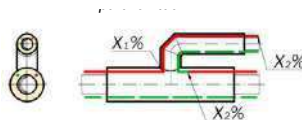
Parallel tee wiring in RADPOL PIPES technology
